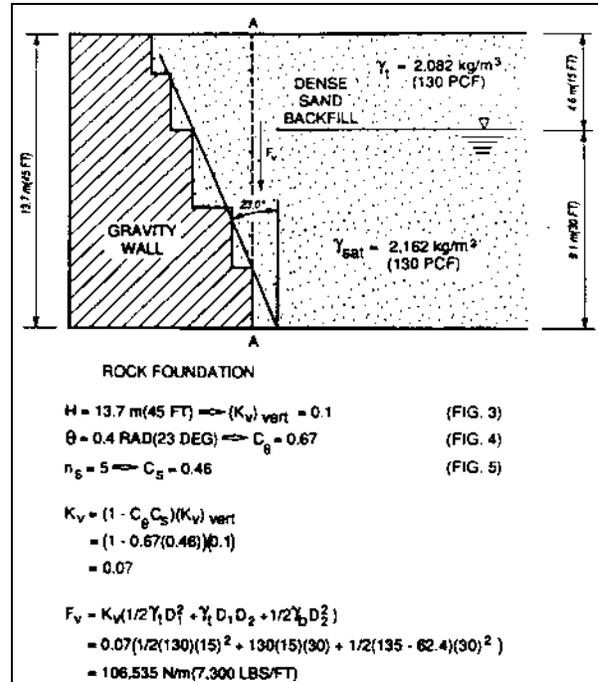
Example calculation of the vertical shear force for a gravity wall founded on rock
